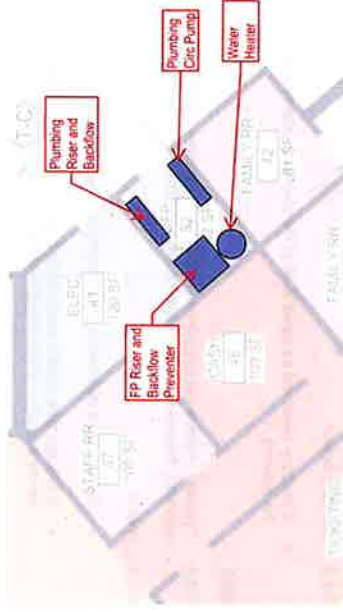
ENTRY BUILDING PLUMBING EQUIPMENT
